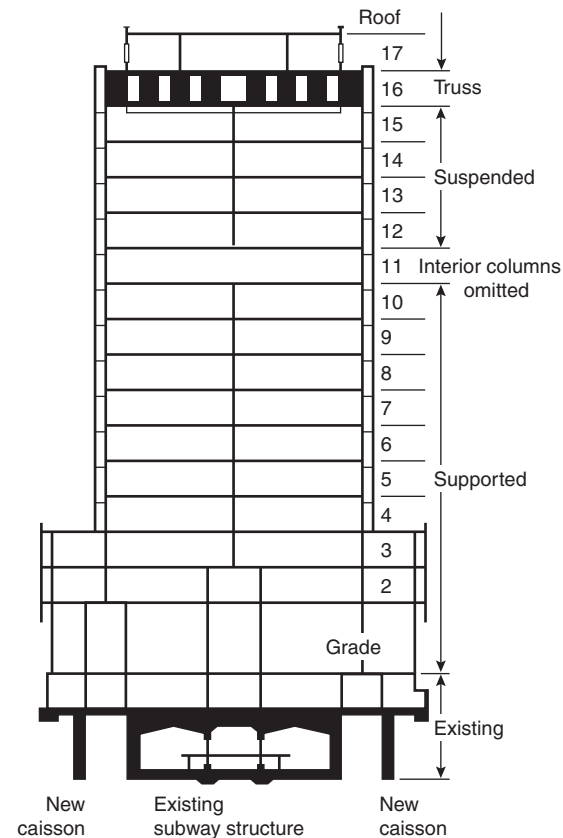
Vierendell truss providing support from above and below.³³
